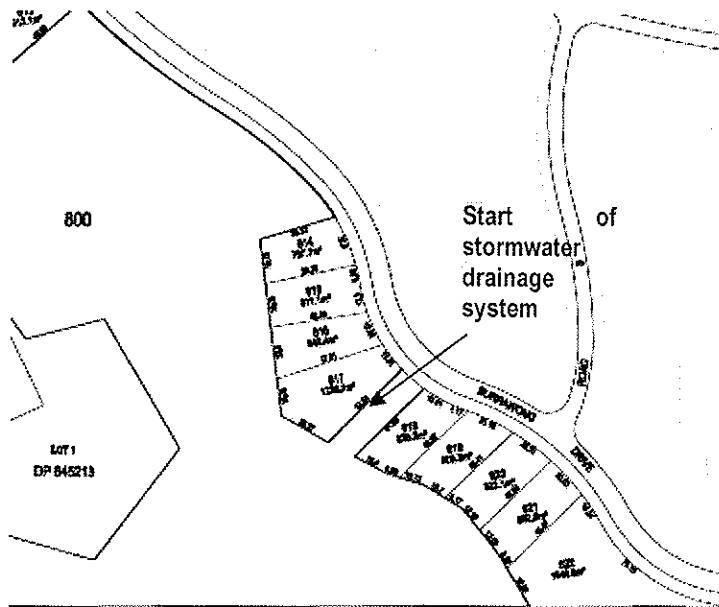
proposed stormwater easement between lot 617 and 617 (Source: PPR)
